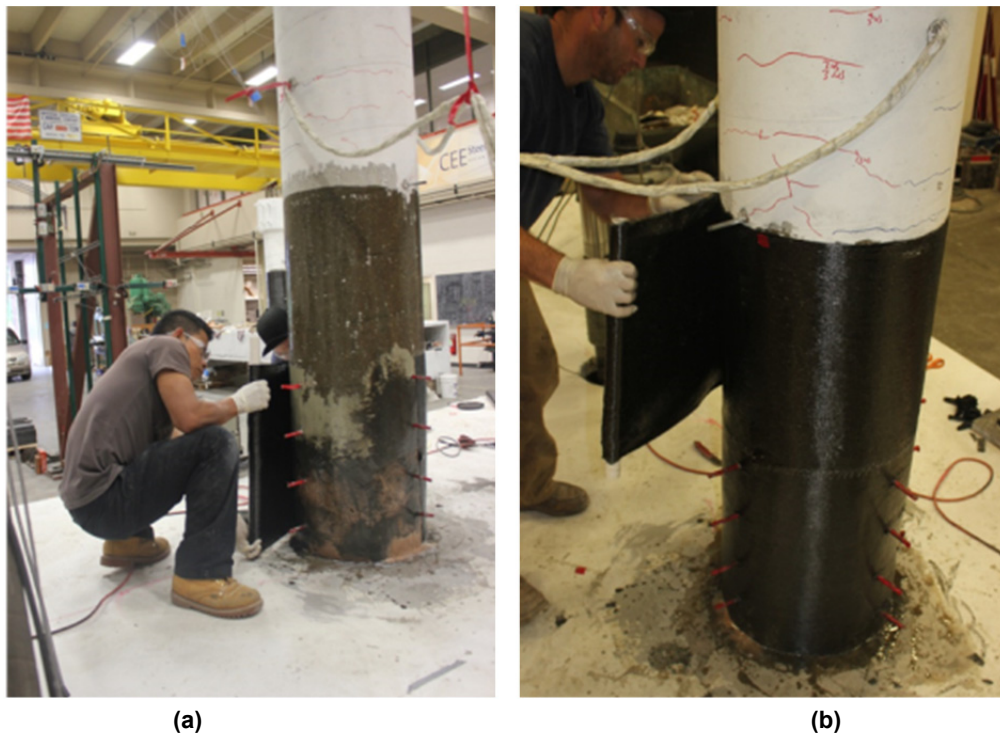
(a) Applying the first epoxy-coated CFRP layer at the bottom section of the column; and (b) applying the last CFRP layer at the middle section of the column.
